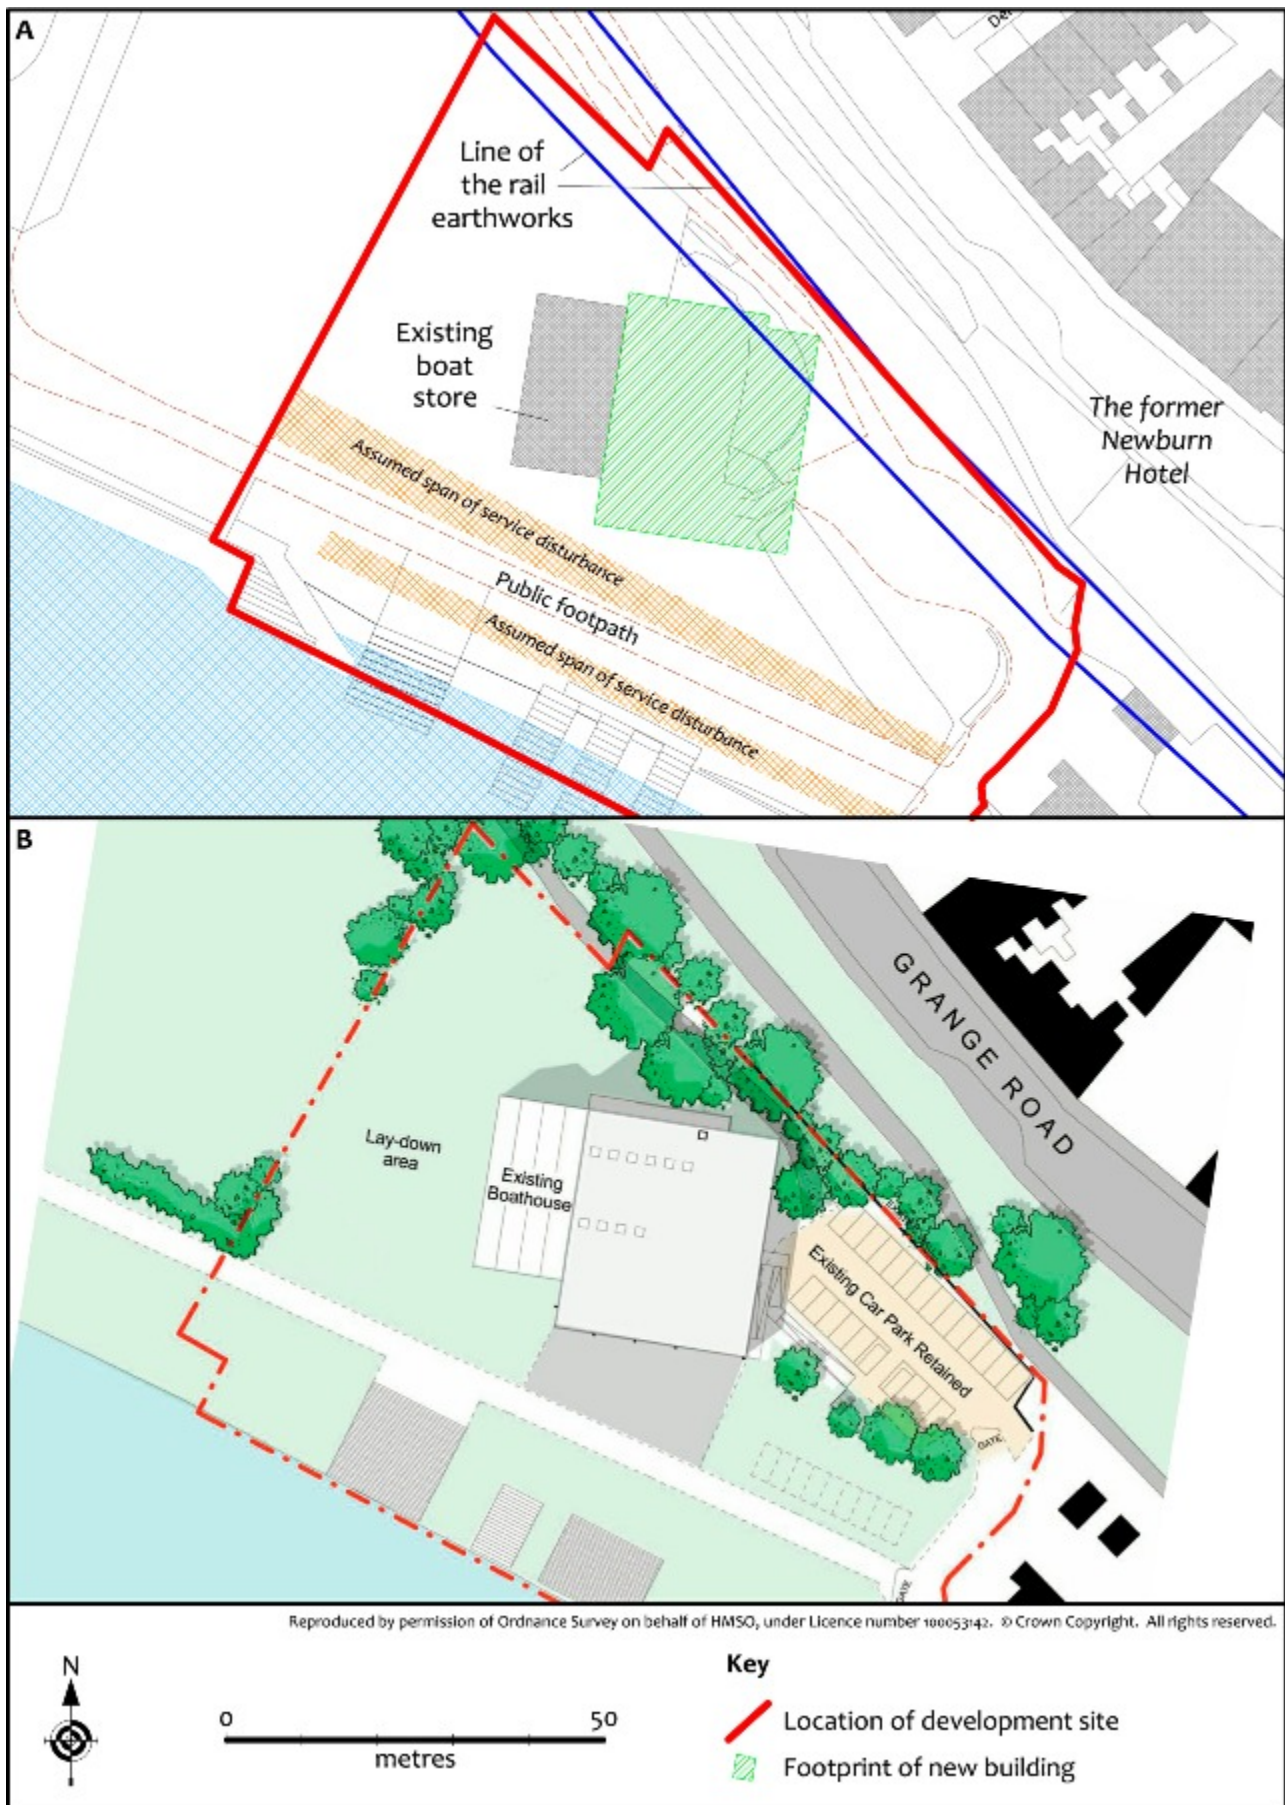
A: Main impact area of new boathouse foundations, B: Client-provided proposed plan
